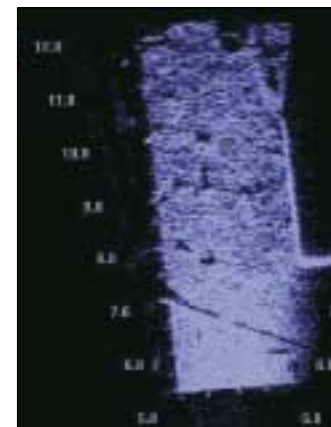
The surface of a concrete foot of a bridge abutment. Range markers are in meters.
